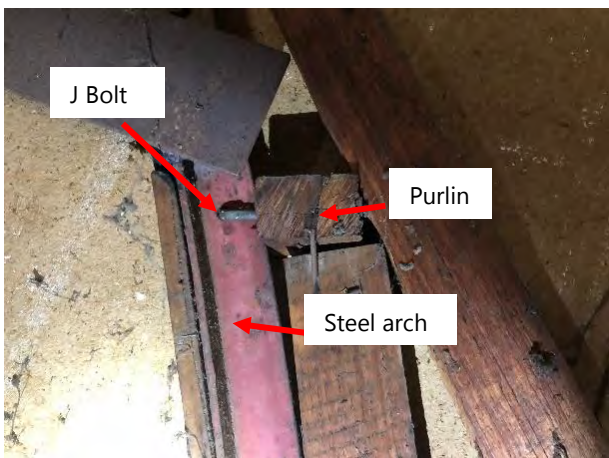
2" x 2" steel rib arch (reddish colour) Purlin is evident (the cut end of a purlin is shown) J bolt to hold purlin to outside of rib
